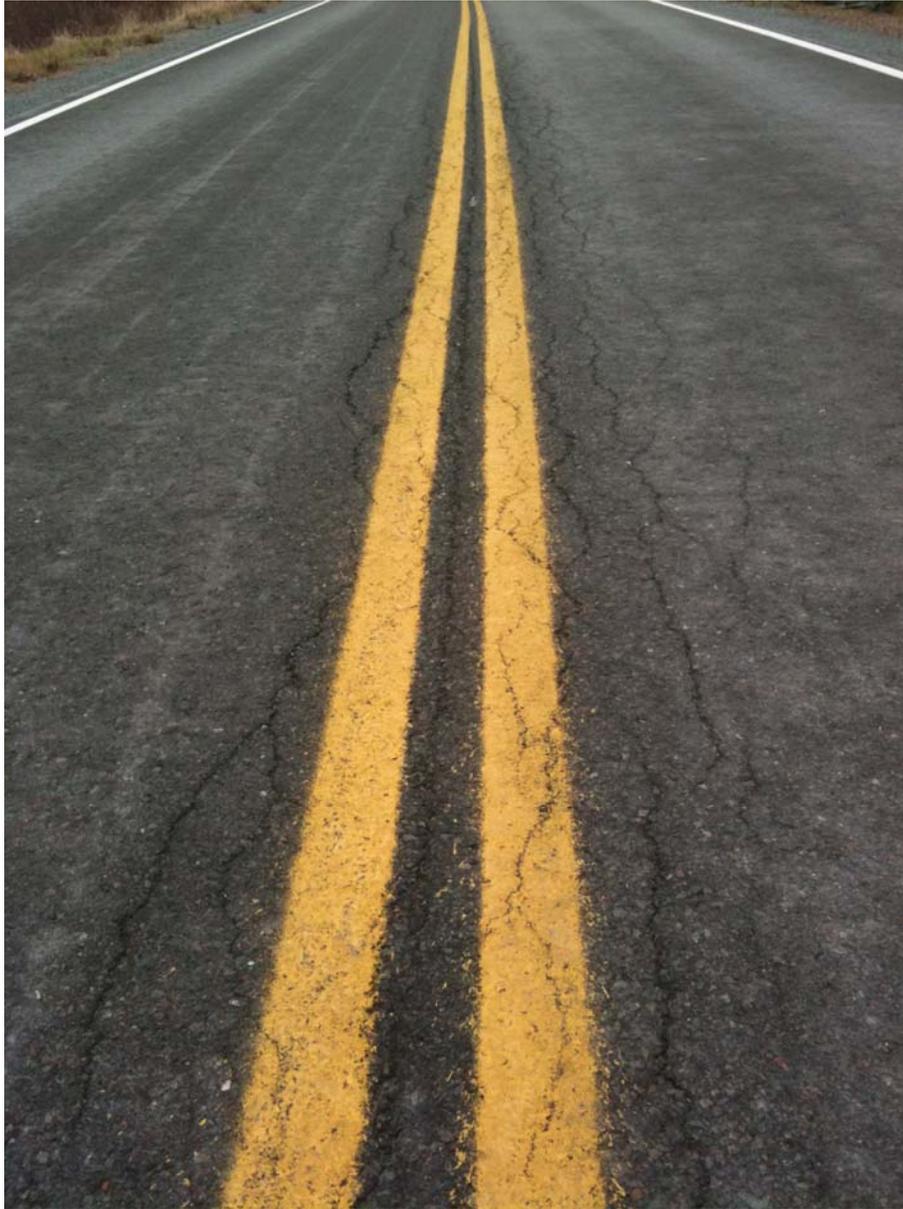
Severe centreline cracking observed on Pt. Michaud beach Road PC-FDR pavement.
